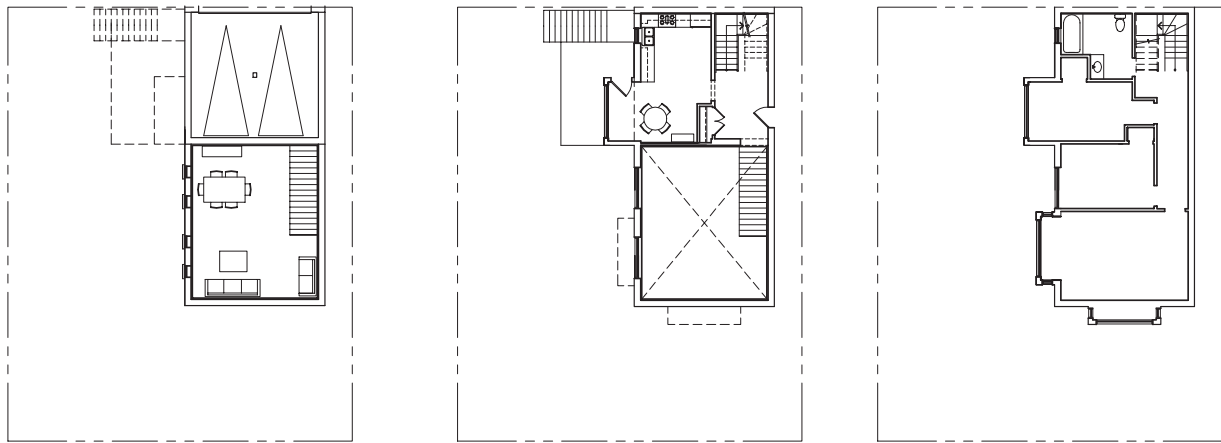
Typical floor plans of a 3 bedroom floating floor unit.
